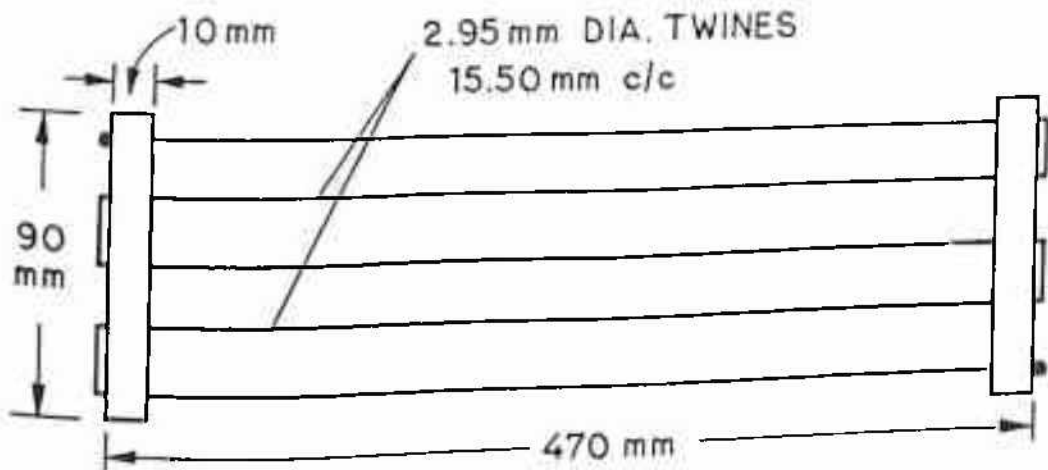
DETAILS OF TEST BEAMS FOR FLEXURAL CHARACTERISTICS.
